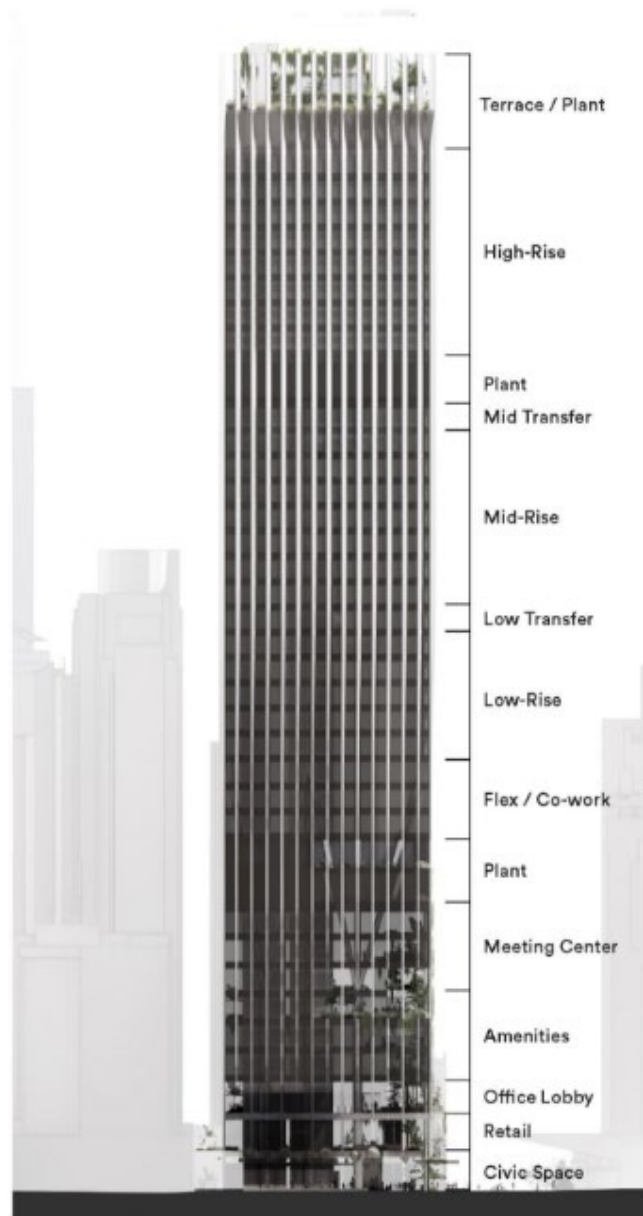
Proposed Elevation (By Henning Larsen/Architectus)
